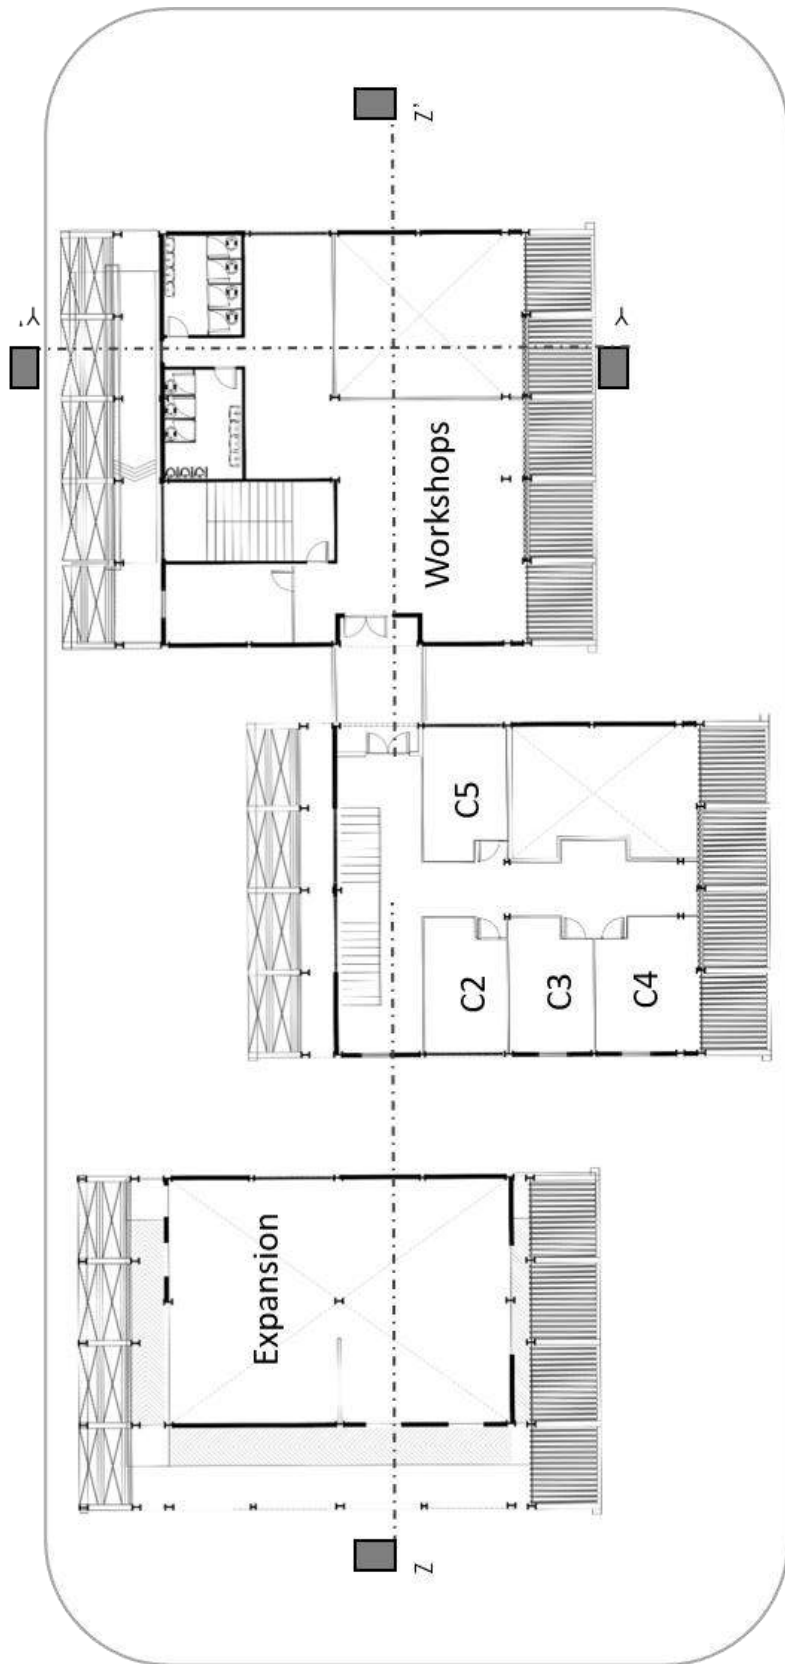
Second Floor Plan of Cyclone Shelter (Source: Author)
